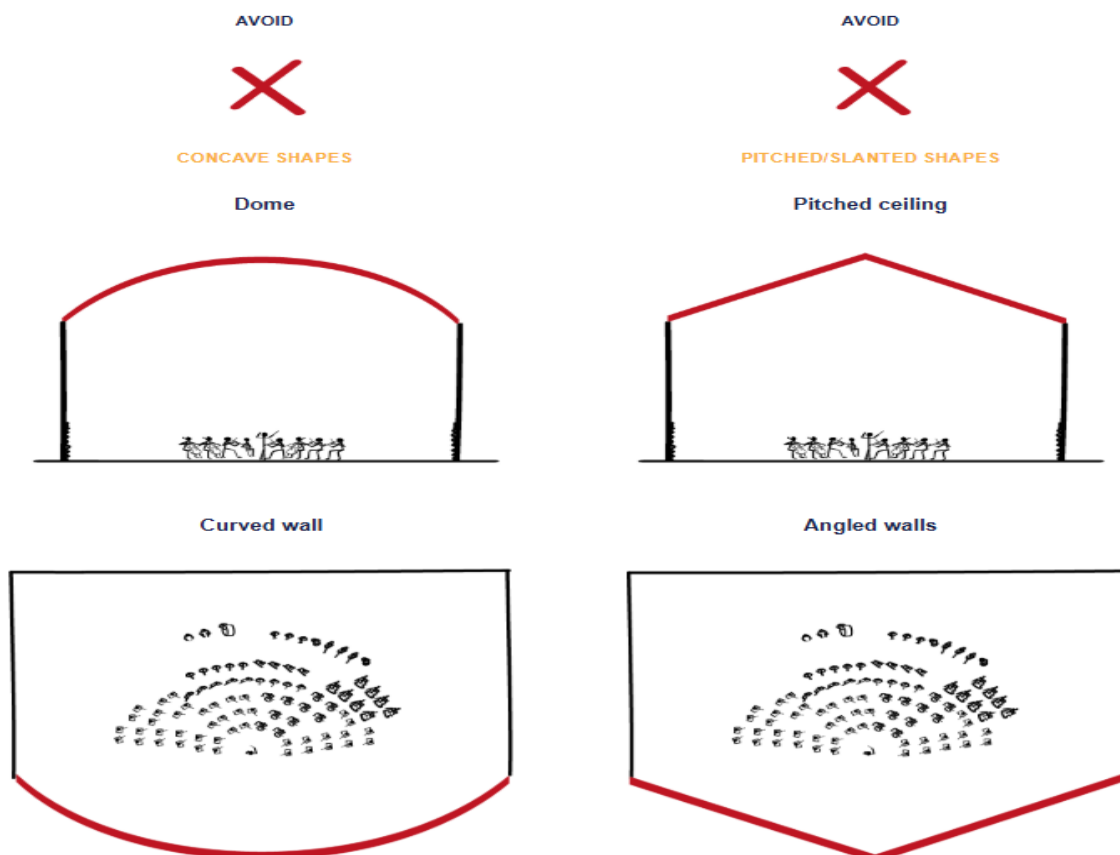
Diagram showing to avoid Concave, pitched / slanted surfaces
